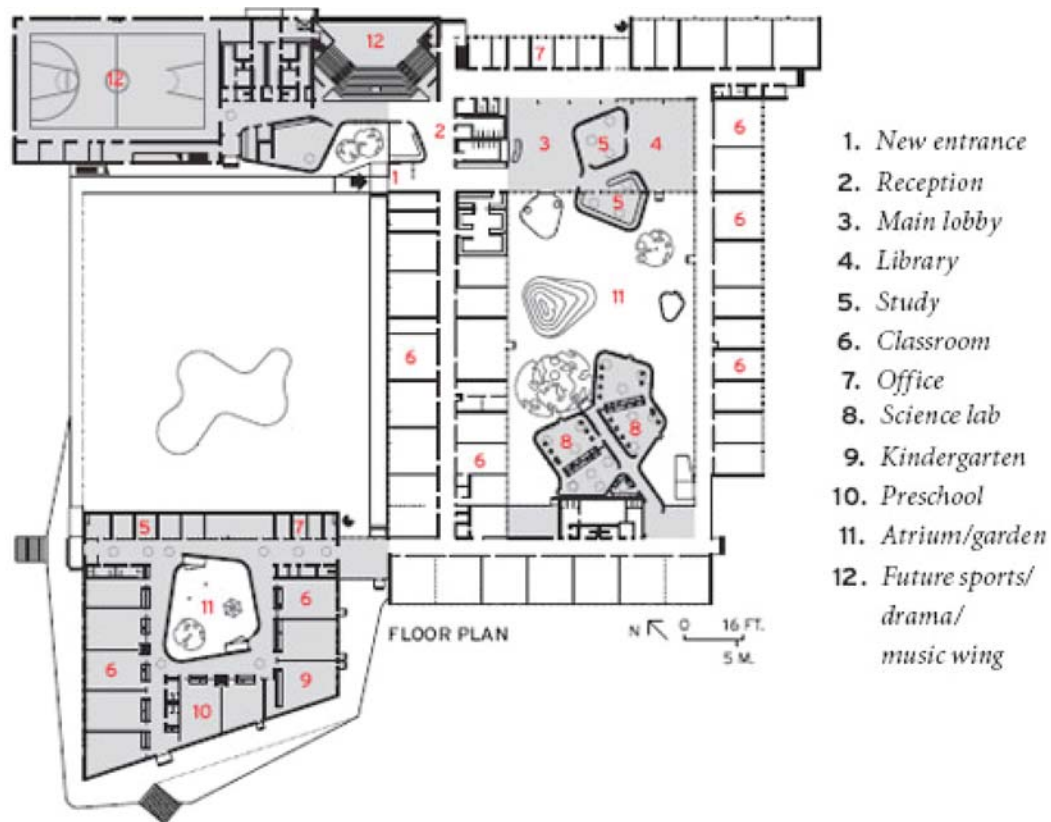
Floor plan of Oslo International School drawn by Jarmund/Vignæs Architects. Adapted from "Oslo International School: Jarmund/Vignæs Architects Transforms a Worm 1960's Era School Building into a Vibrant Learning Environment" by P. MacKeith, n.d., retrieved from http://archrecord.construction.com/projects/bts/archives/k-12/09_Oslo/default.asp?bts=k12
